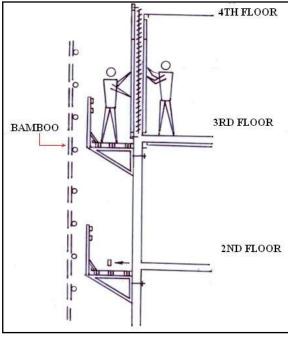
Removing Kicker from 2nd floor level & erecting all formwork on 3rd floor
